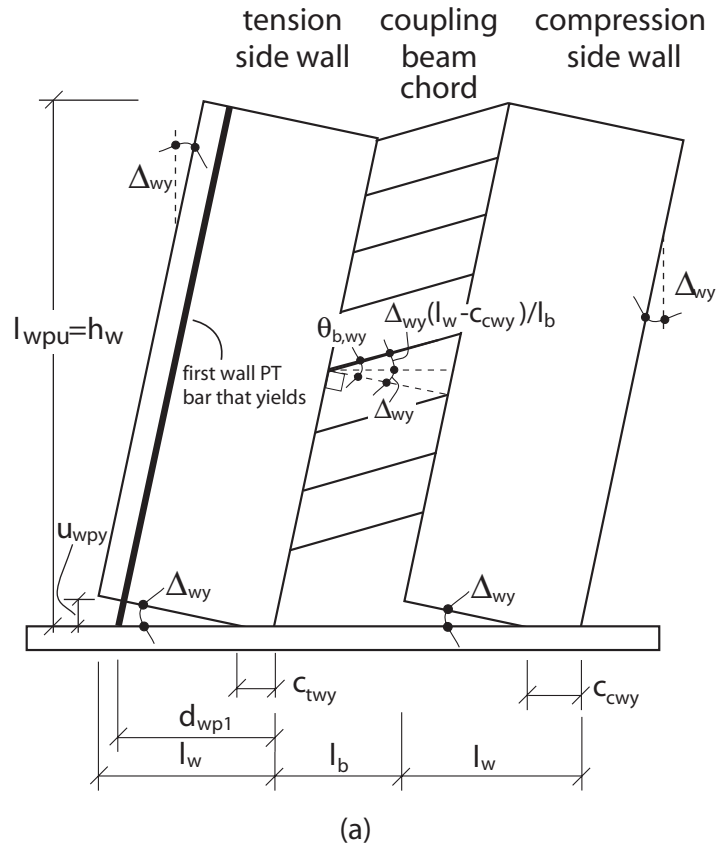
Coupled wall PT-yielding state for systems with precast concrete walls:
